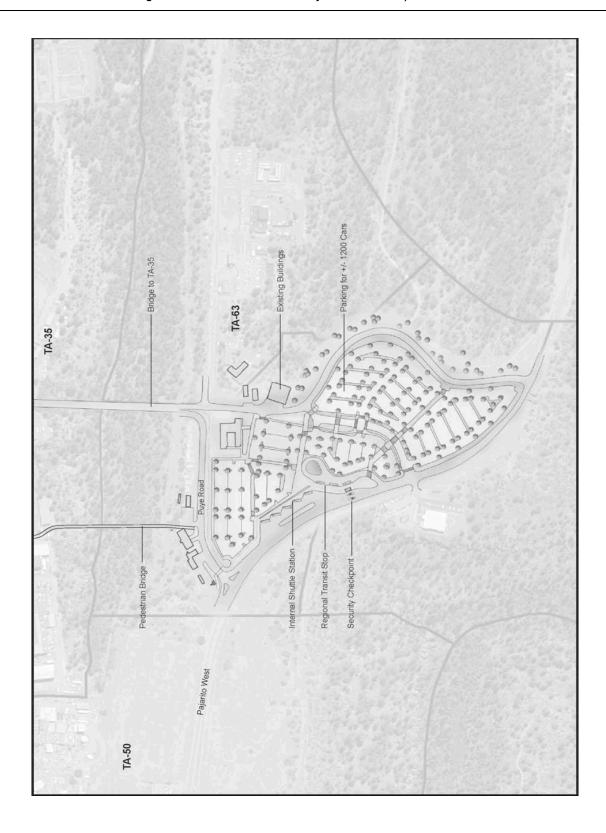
Conceptual plan for proposed transportation improvements around TA-35 and -63.
